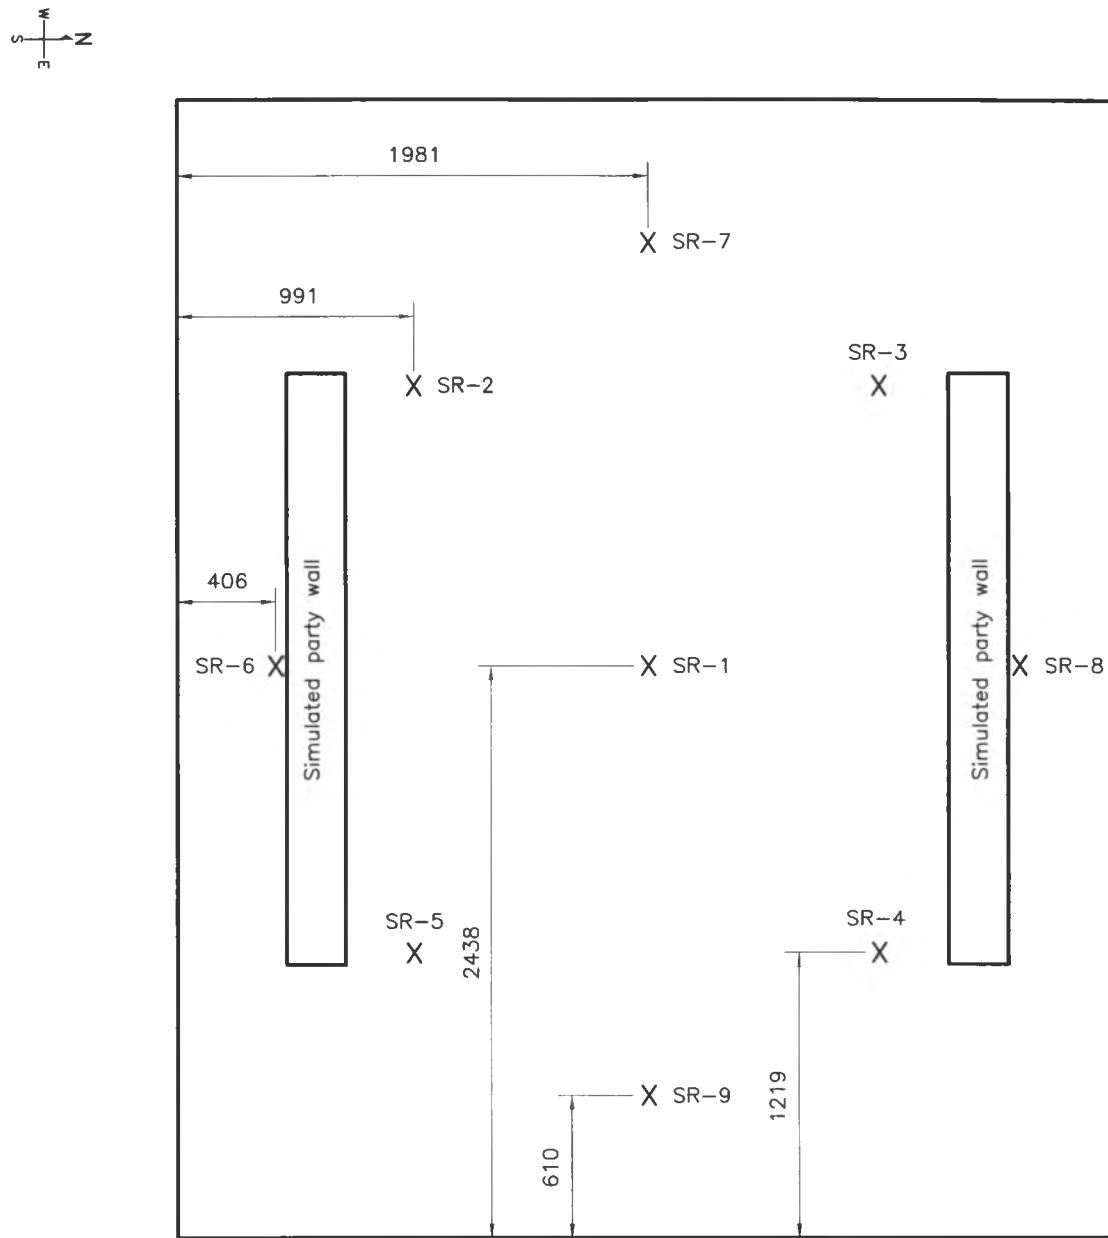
Assembly No. 2, Location of Floor Internal Thermocouples
